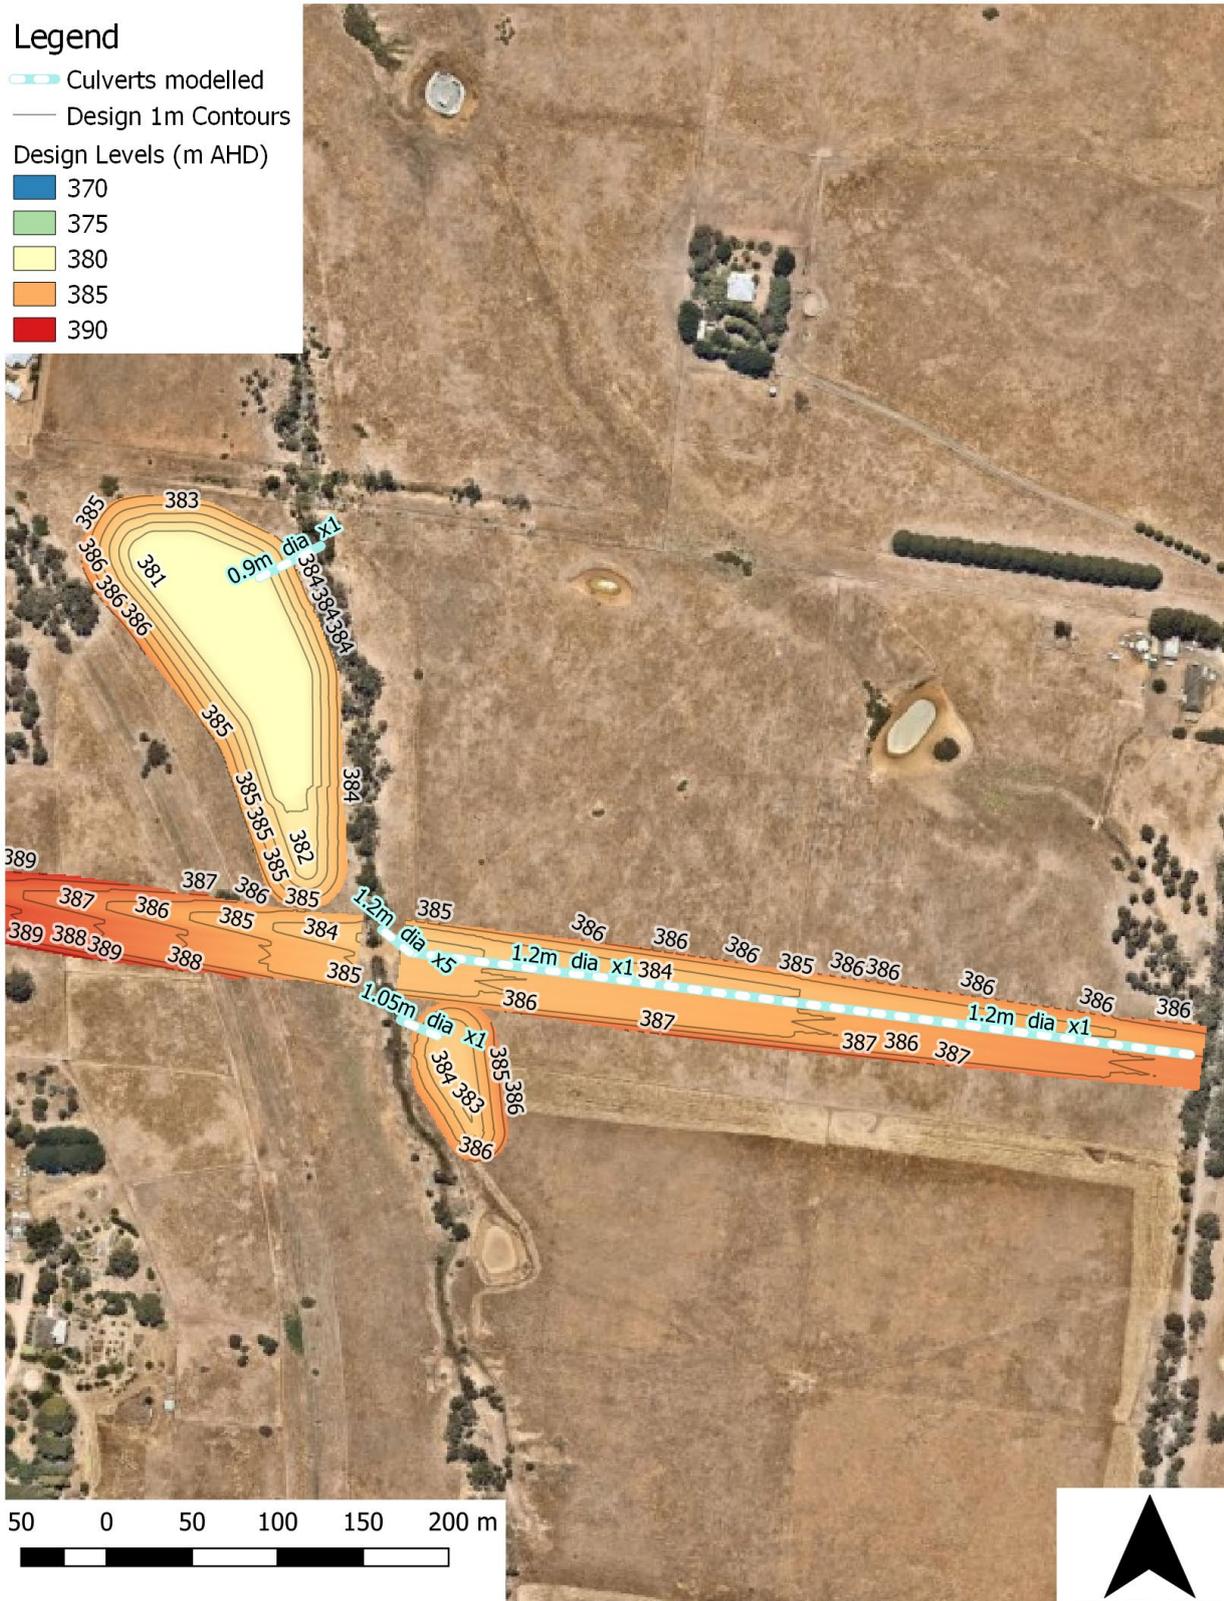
Proposed design of Green Link, McIvor Rd Storage, and Wandong Rd Storage
